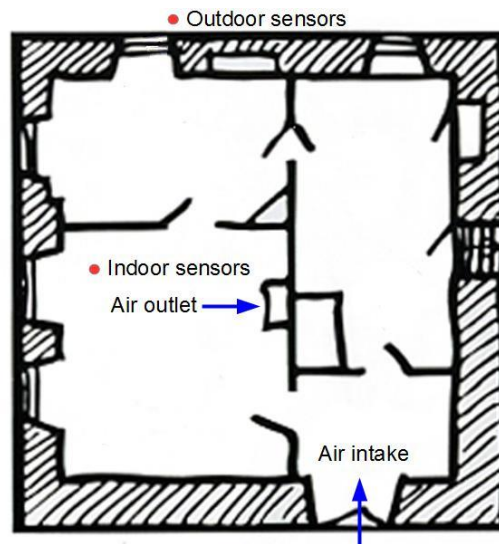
Plan over the farmhouse with indication of sensor and actuators positioning
